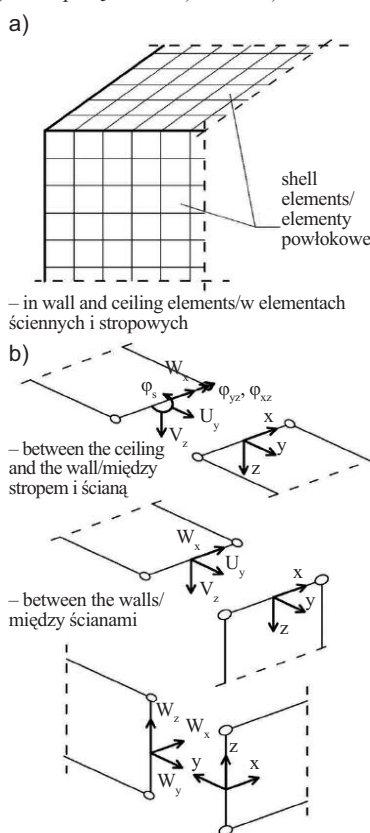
Modelling of walls and slabs in the plate module: a) module model; b) connection model
